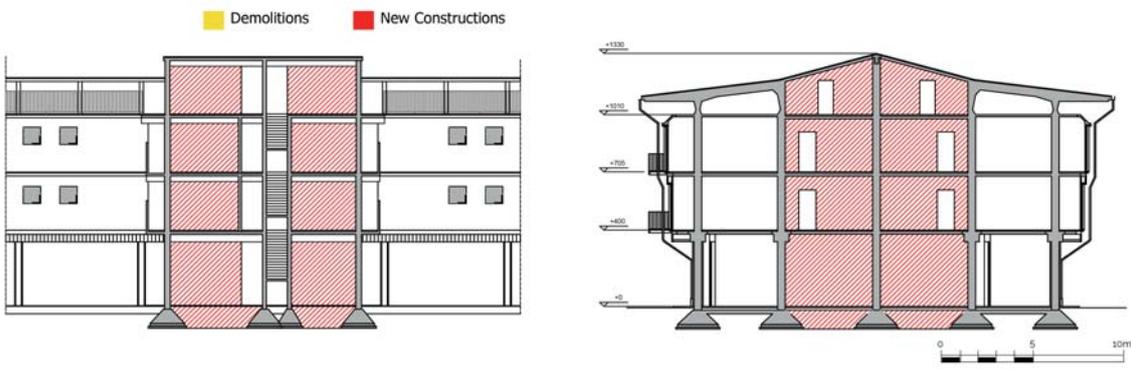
Insertion of reinforced concrete walls for the “Treno”.
